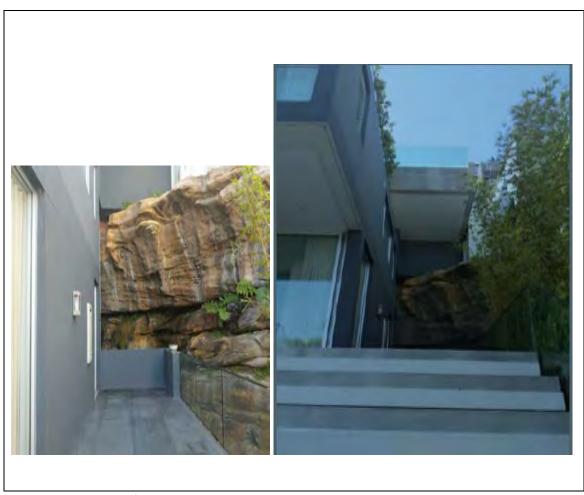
Subject site of proposed addition, on the existing terrace, looking north. Proposed addition's location looking north (Source – aSquareplanning)
